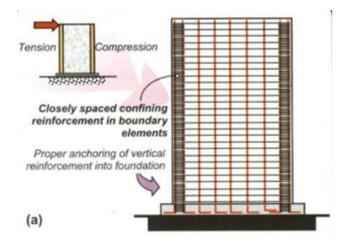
Shear wall main reinforcement layout according to IS:13920-2016 (Source: IITK-BMTPC Earthquake Tips)
